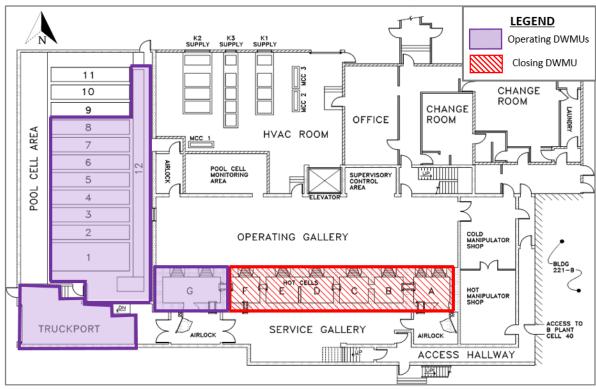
Waste Encapsulation and Storage Facility 225-B Building Detailed First Floor Plan
